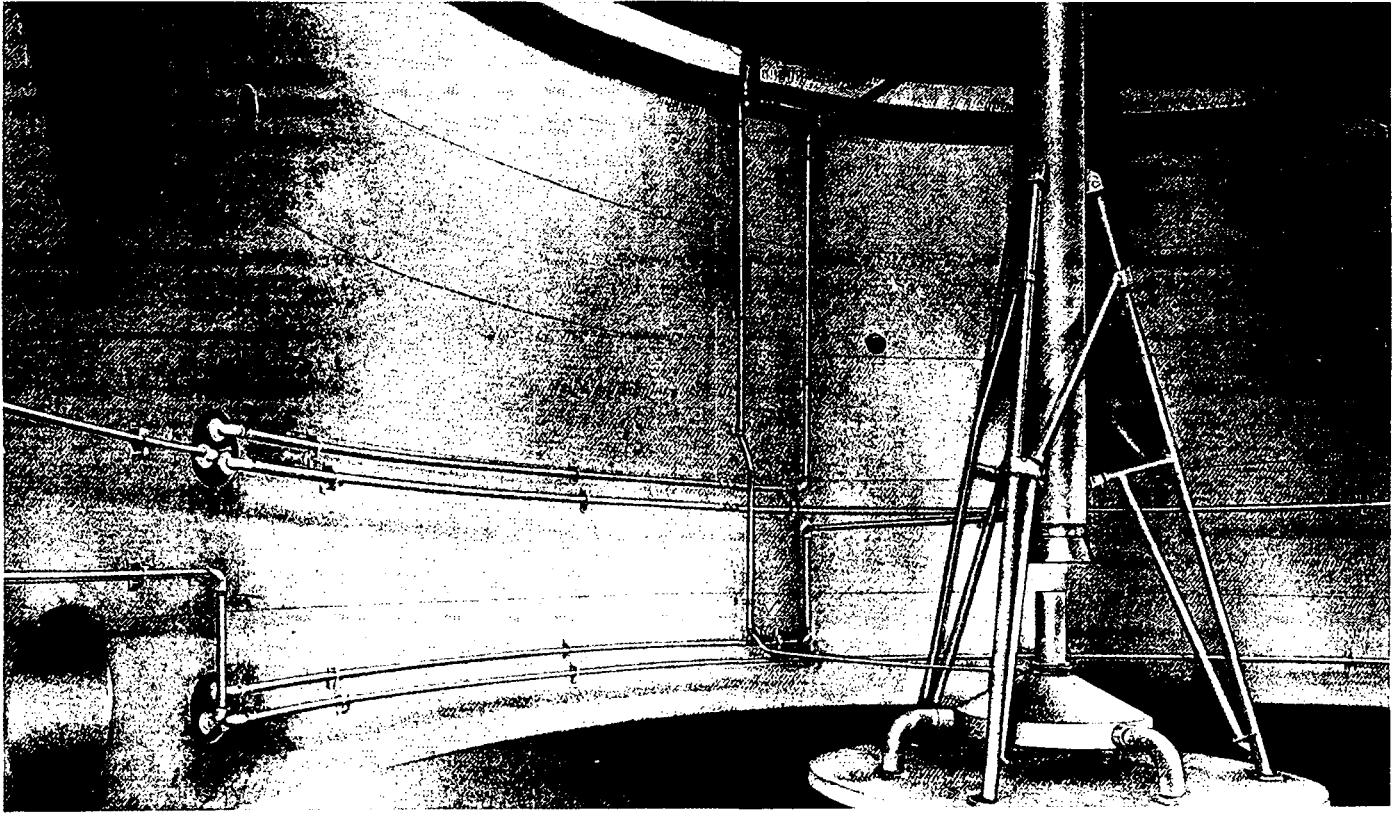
Arrangement of 'Burper-mixer' in sludge digester.
